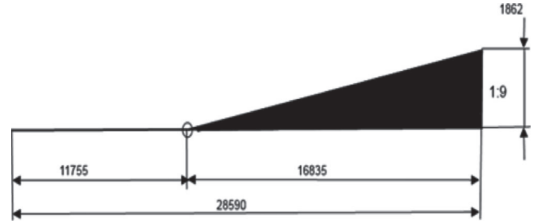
Layout of 1 in 9 crossing angle switch design, all dimensions in millimetres. Maximum permitted train speed for this switch type (in diverging route) is 40 km/h.
